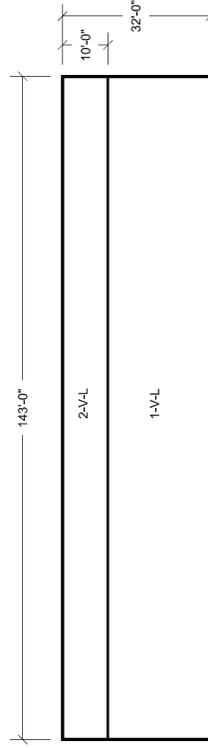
H.6-6Z: PUMP HOUSE SOUTH WALL LOOKING SOUTH
